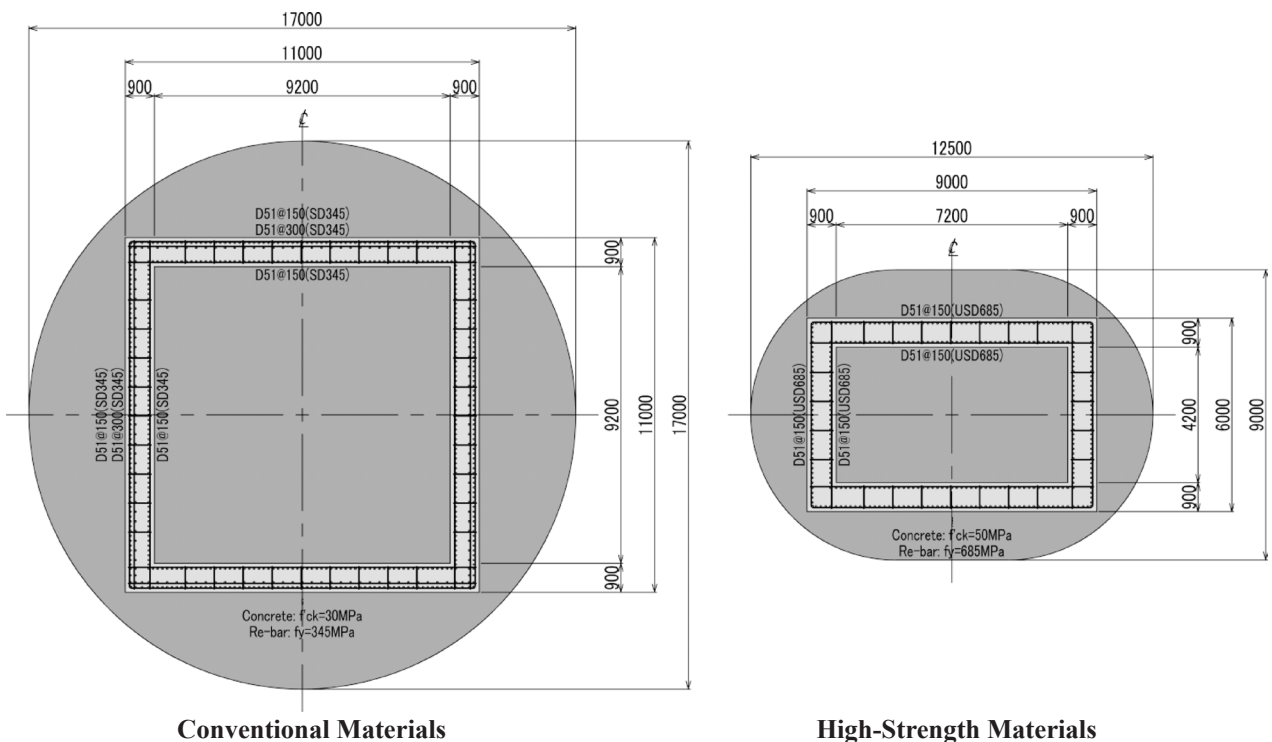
Cross section of main pier column and foundation (unit: millimeter)
